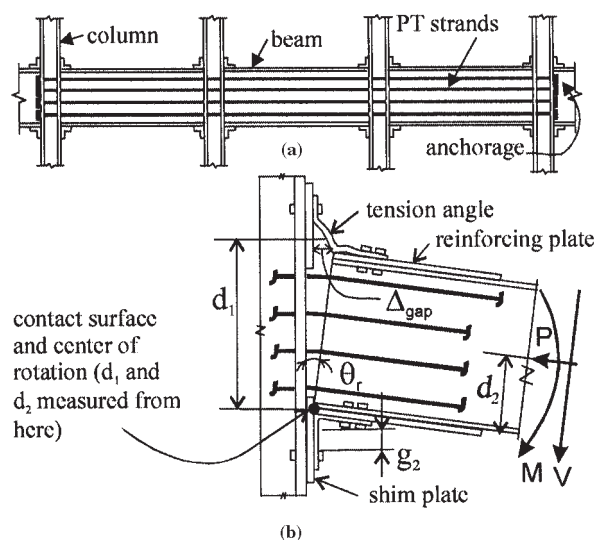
Section of frame with (a) high strength strands, and (b) deformed connection.
